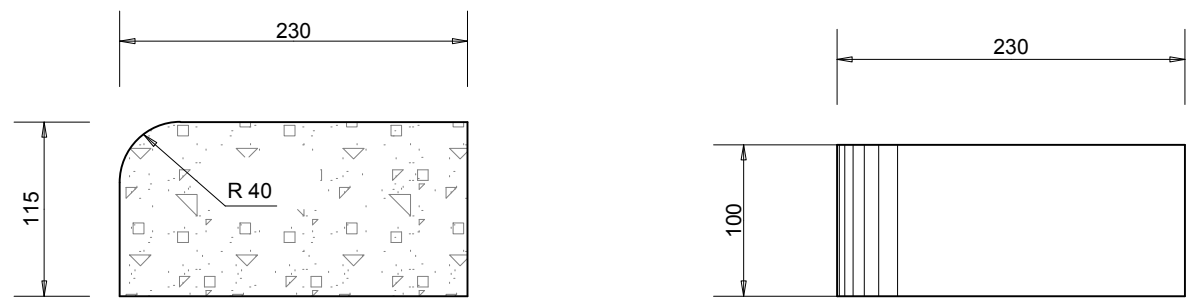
DETAILS OF STANDARD BUILT UP SECTIONS FOR BENDS AND
